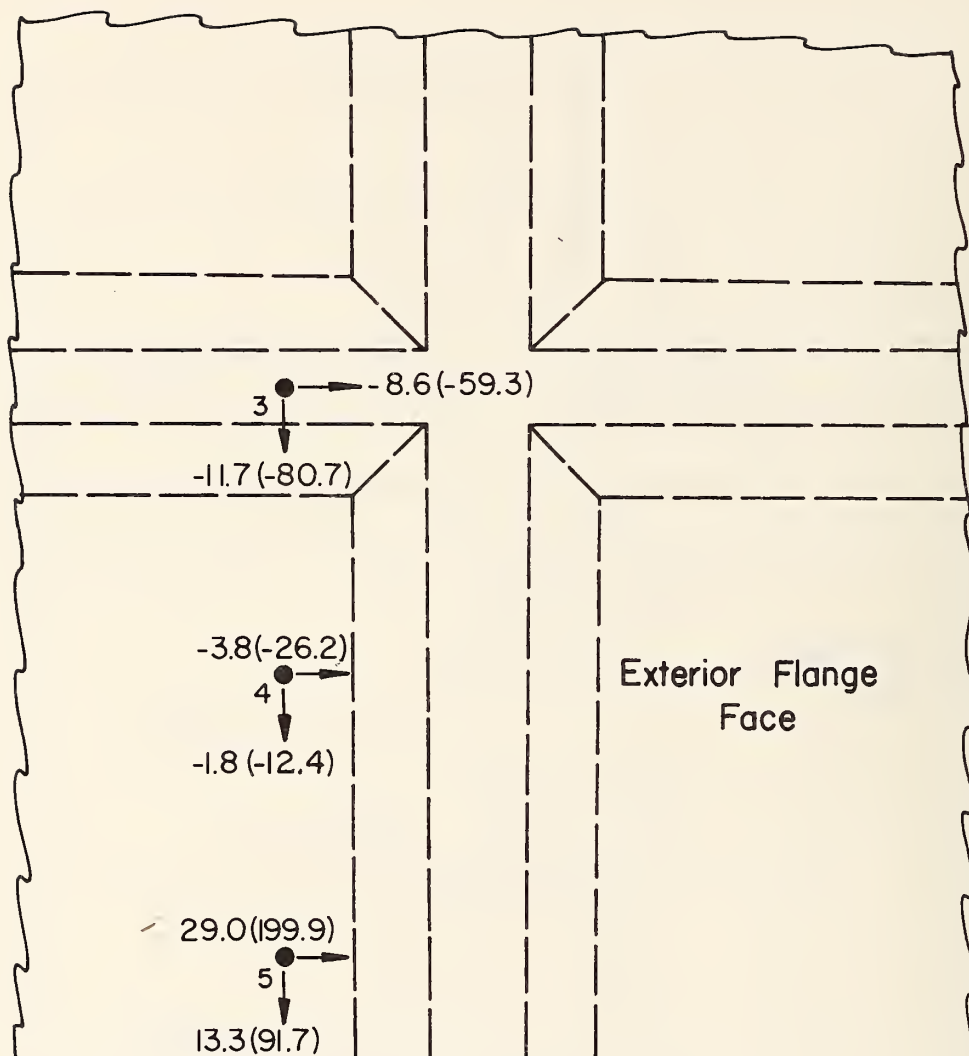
Unwelded End Cover Plate Surface Residual Stress
